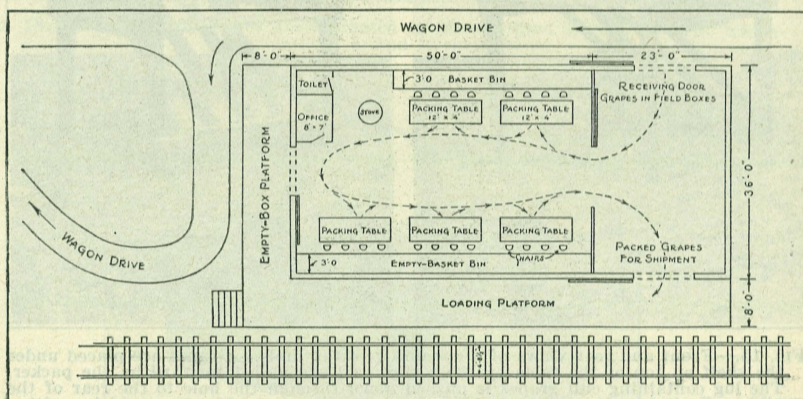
Floor plan of grape-packing house. Note arrangement of packing tables, packers' chairs, and basket bins
